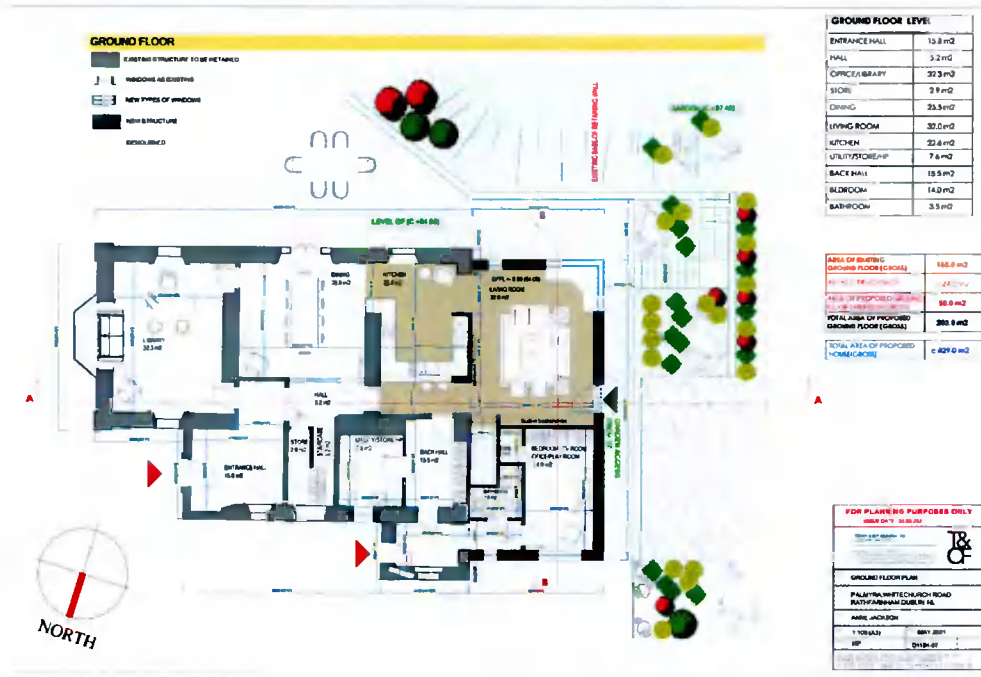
Ground Floor Plan. Showing proposed Alterations and Extension. Not to Scale
